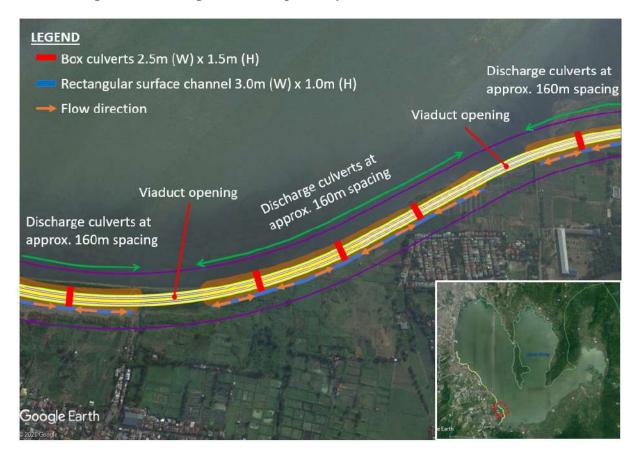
Preliminary Drainage Scheme at Shoreline Embankment
